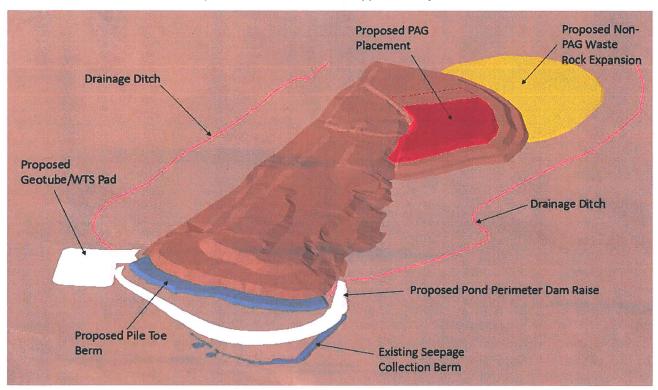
End of November 2018 Waste Rock Deposition Plan- Plan View
